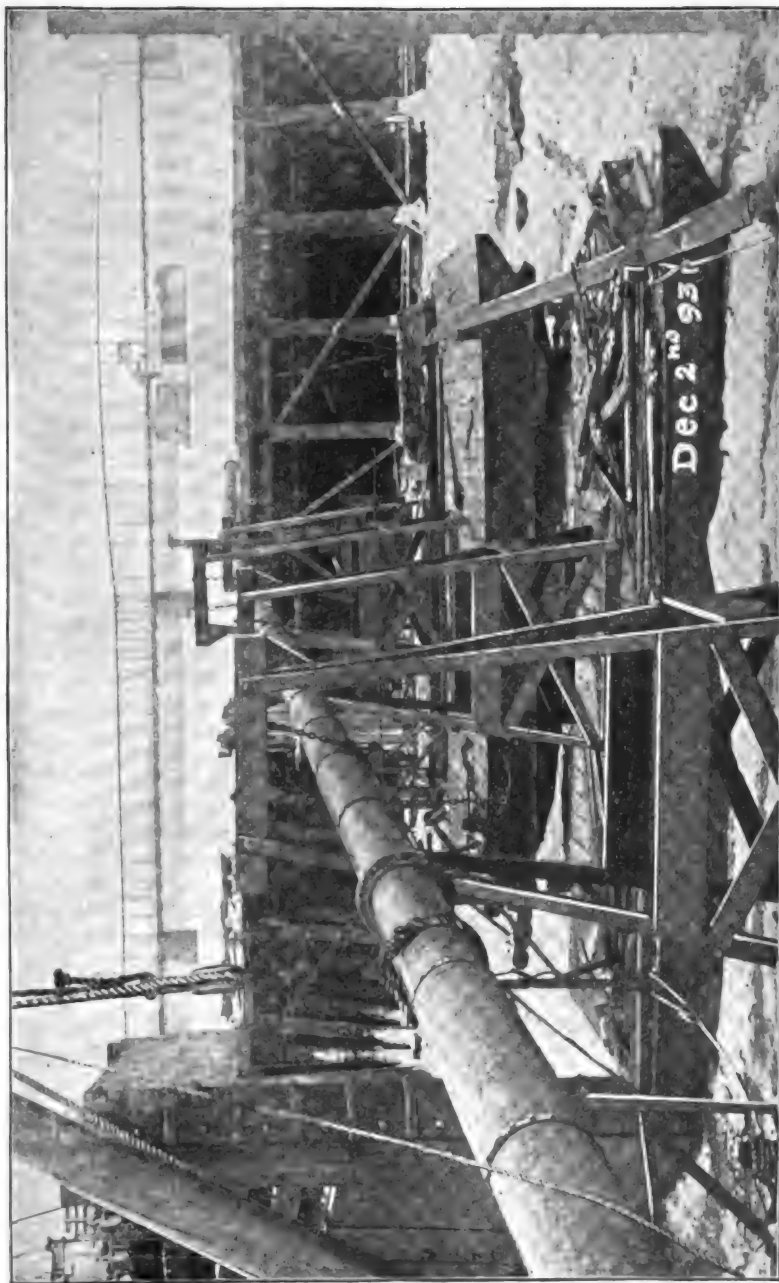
INSIDE VIEW OF BULKHEAD. LOCK PUMPED DRY.
